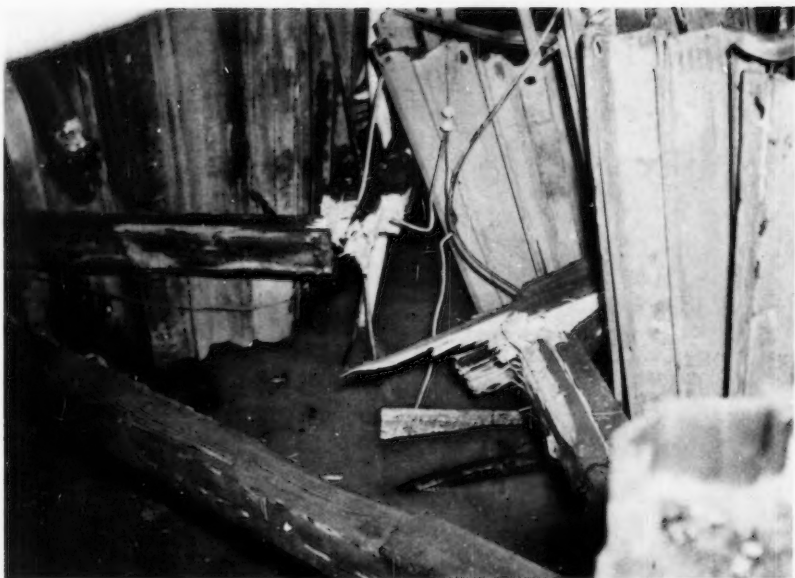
Collapse of Sheet Piles at Penstock Hending.
